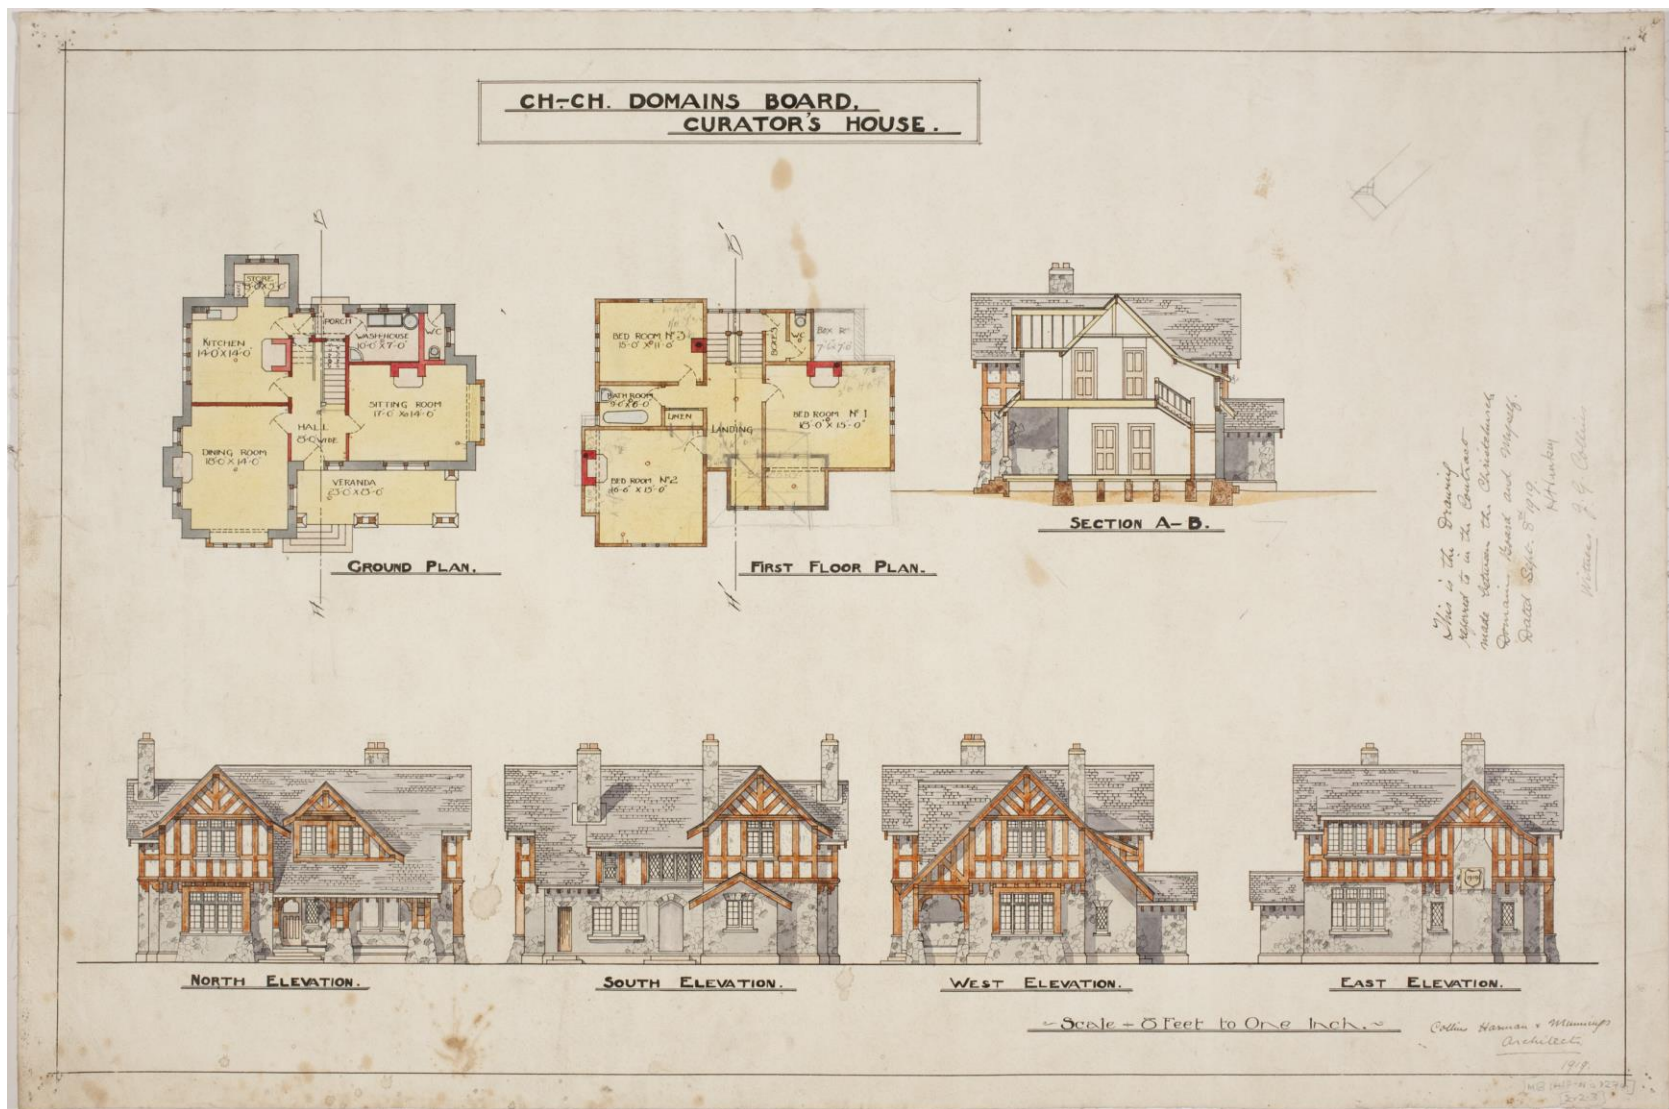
Collins and Harman, Ch.-Ch. Domains Board, Curator's House, plans, elevations and section (1919-1921).
